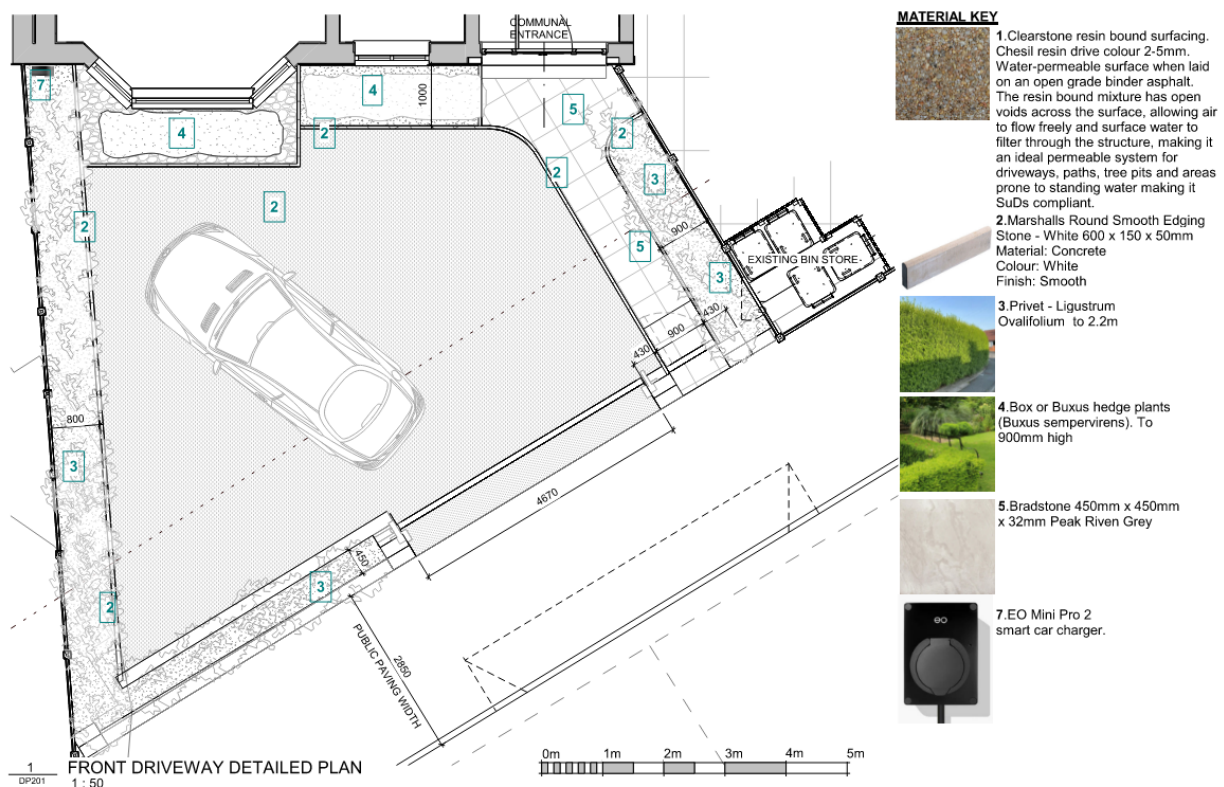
(above): Proposed front driveway detailed plan (source: Proposed drawings)
